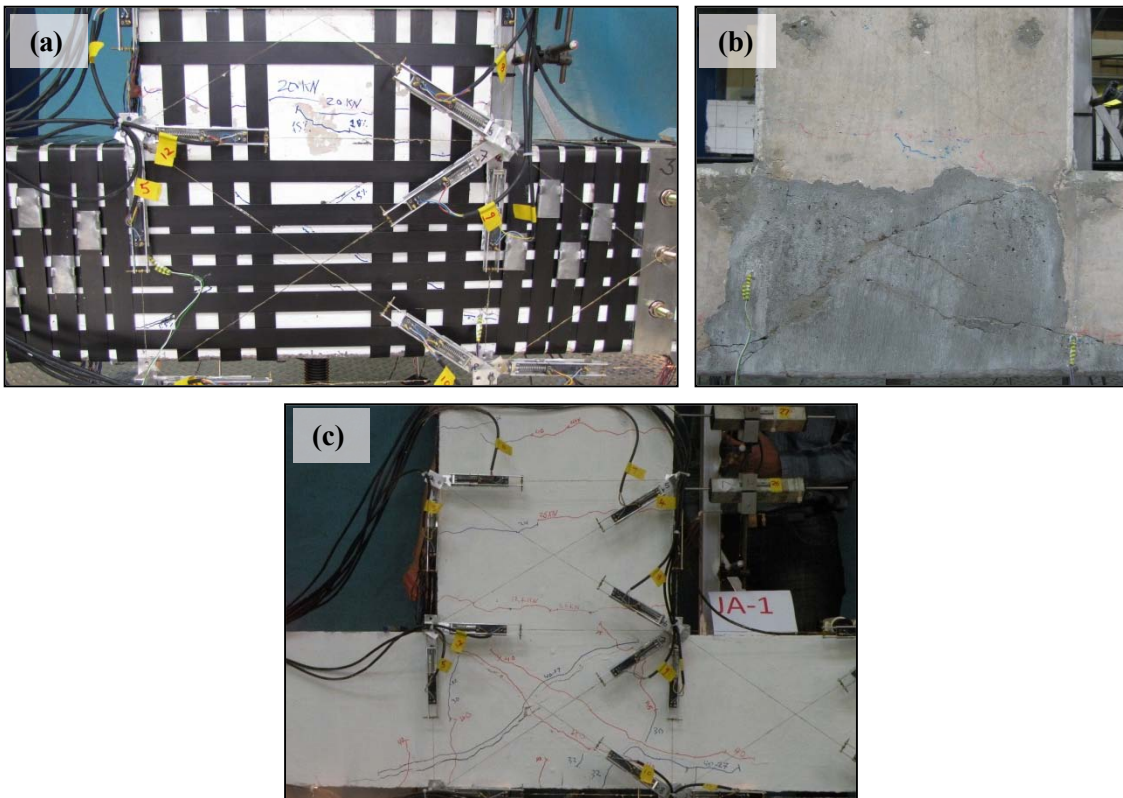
Final cracking Pattern a) with strips installed, b) after removing the strips and c) unit JA-1 at maximum
